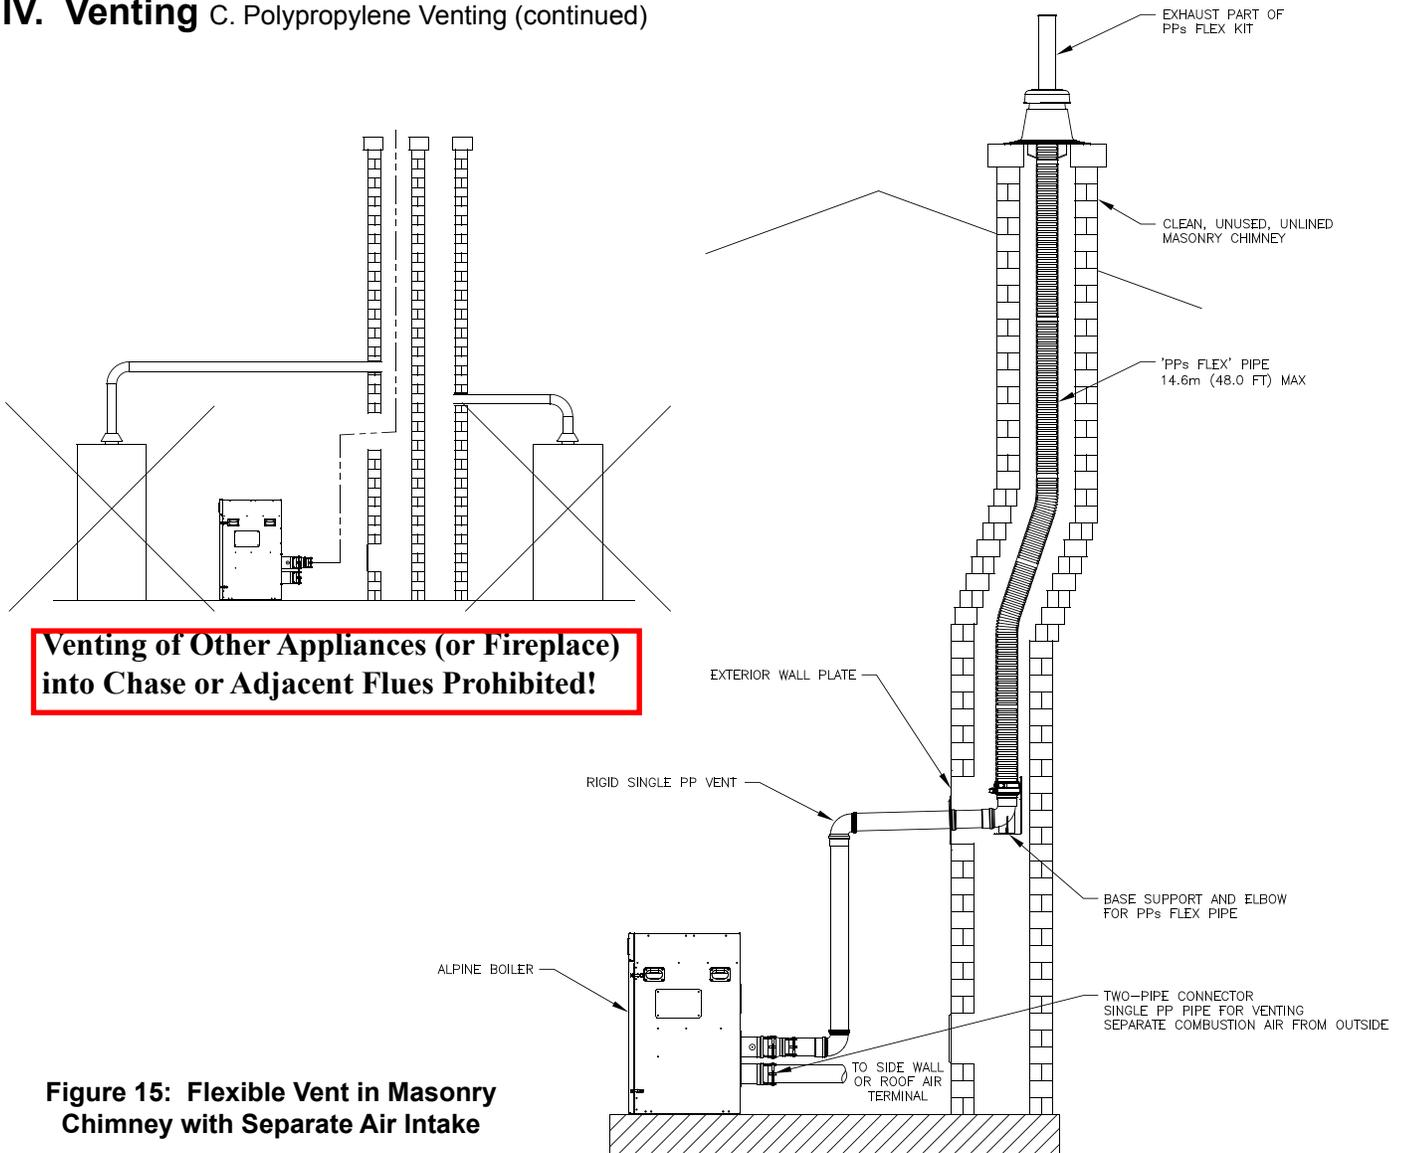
Flexible Vent in Masonry Chimney with Separate Air Intake
